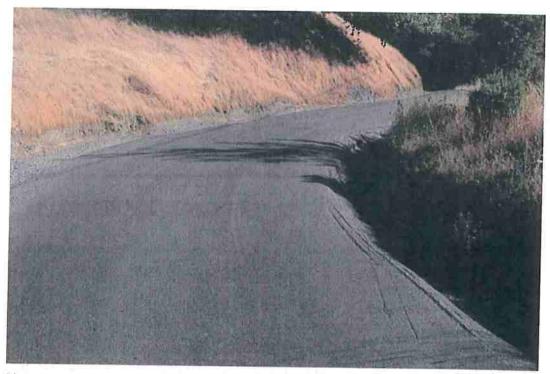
Mile 3.7: 12-ft road width with 1-ft shoulder. Partially blind corner with deep ditch. Potential spot to widen corner on inside to improve width and visibility.
